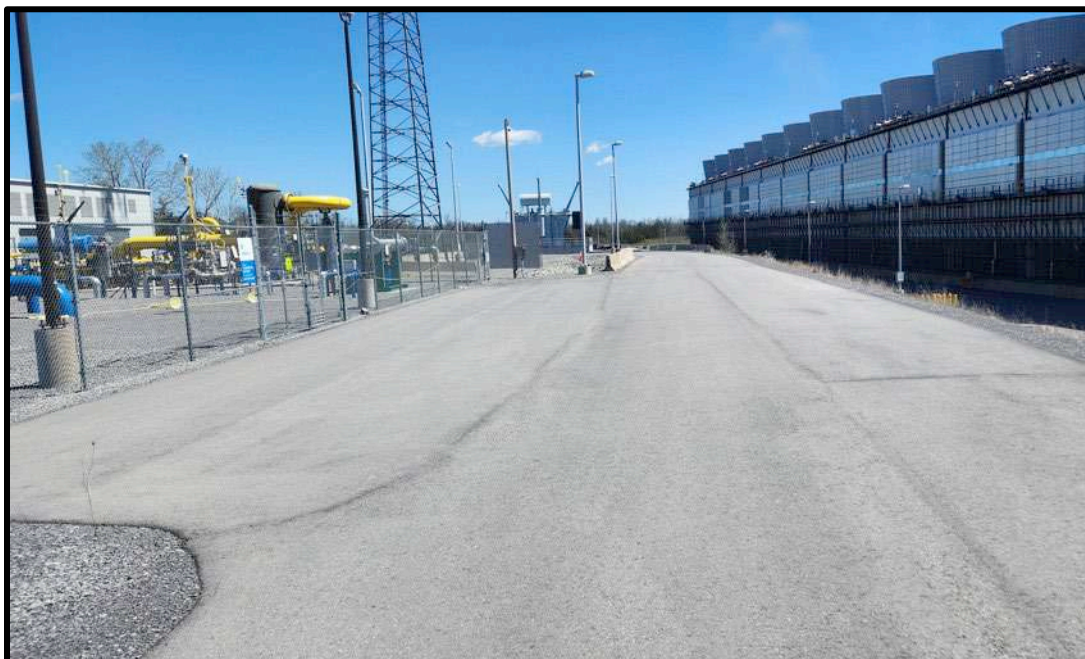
View to southeast of compacted gravel access road in Zone 6. Note Napanee Generating Station buildings in background.
